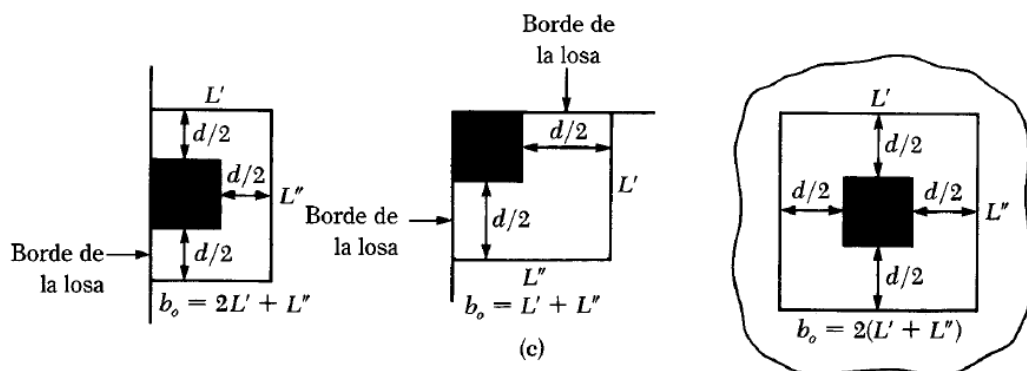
; Determination of b_o for the calculation of the shear capacity of the foundation slab. (Das, 1999)
